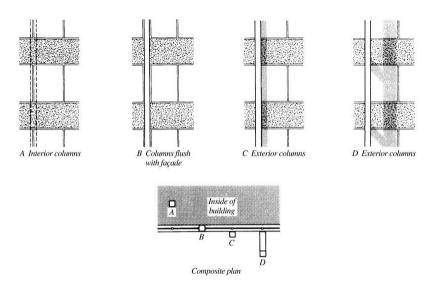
Position of structural frame (column) and its effect on a building's appearance. (Adapted from material in Multi-storey Buildings in Steel by Hart, Henn and Sontag)
